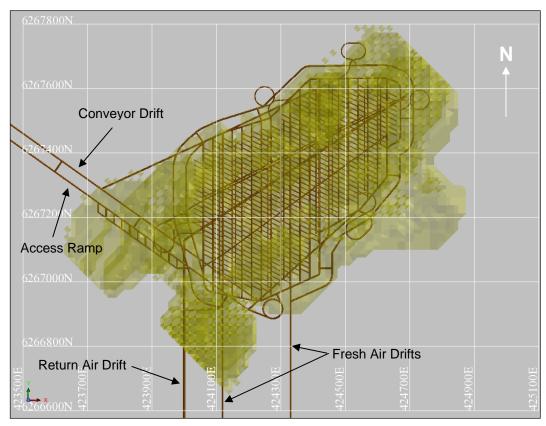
Plan showing mine infrastructure and 0.25 g/t Au grade shell
